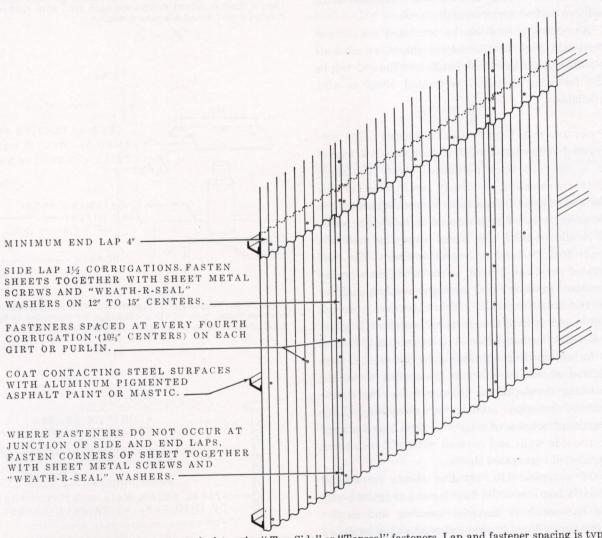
Siding application on steel girts using "Top-Side" or "Topseal" fasteners. Lap and fastener spacing is typical for rivet-stud fasteners.
